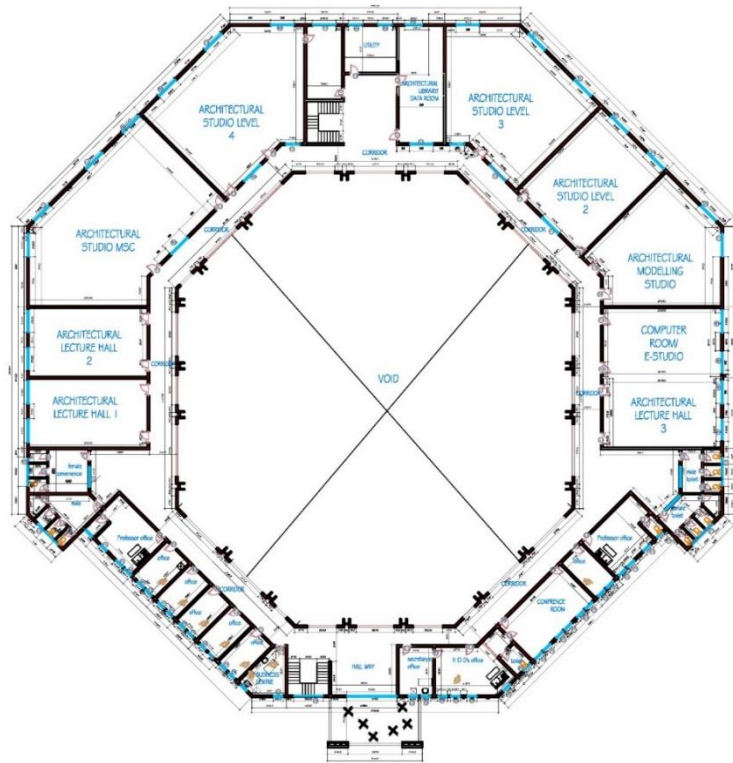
Original Architectural Floor Plan of Architecture Department (Block J)
